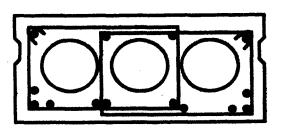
Prestressed Slab Beam Bridge Reinforcement
